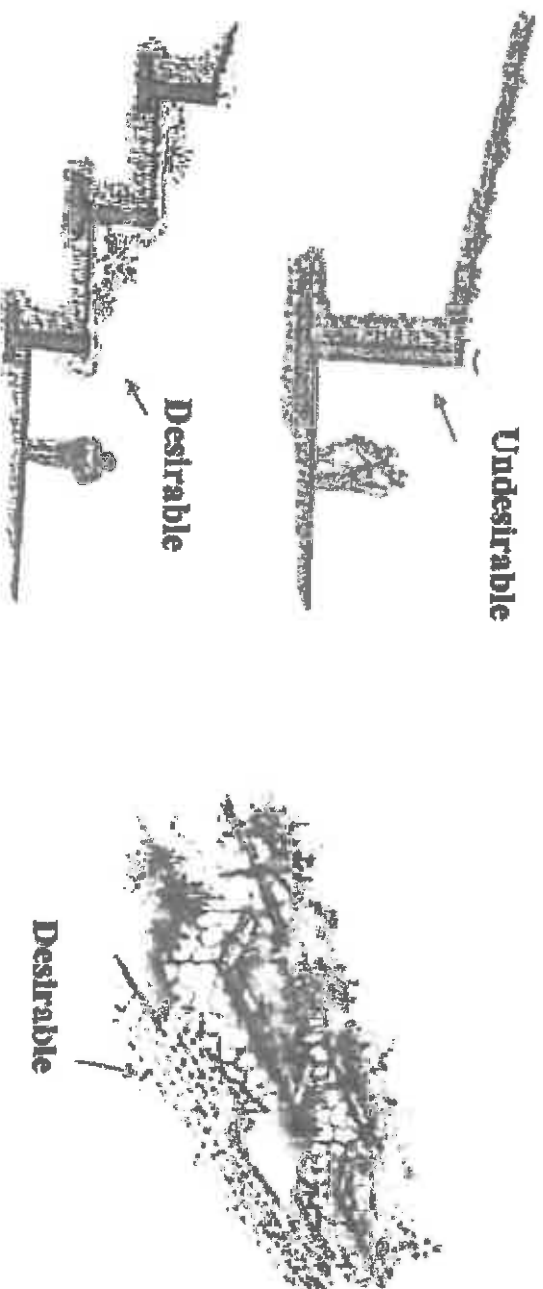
Breaking retaining walls up into low segments brings them into human scale, and provides an opportunity to add plantings. Undulating retaining walls provides an opportunity to add plantings, both in front of the wall and within planters.
